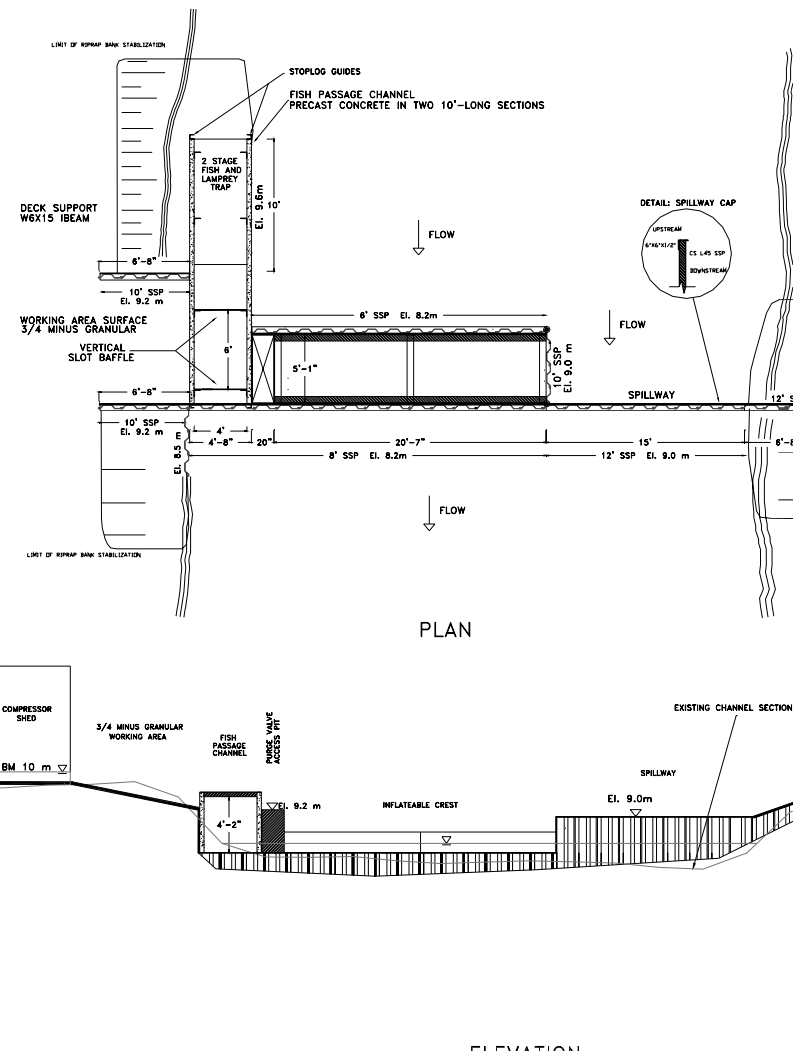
Plan and Elevation, Big Carp River barrier and fishway.
